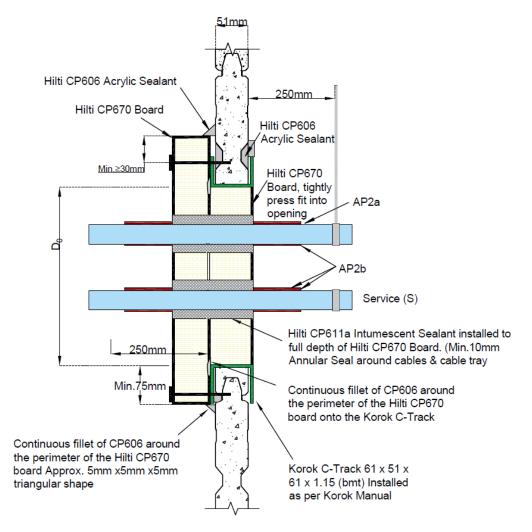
Large cable tray opening with D1 and D2 cable group in 51 mm and 78 mm Korok panel system
